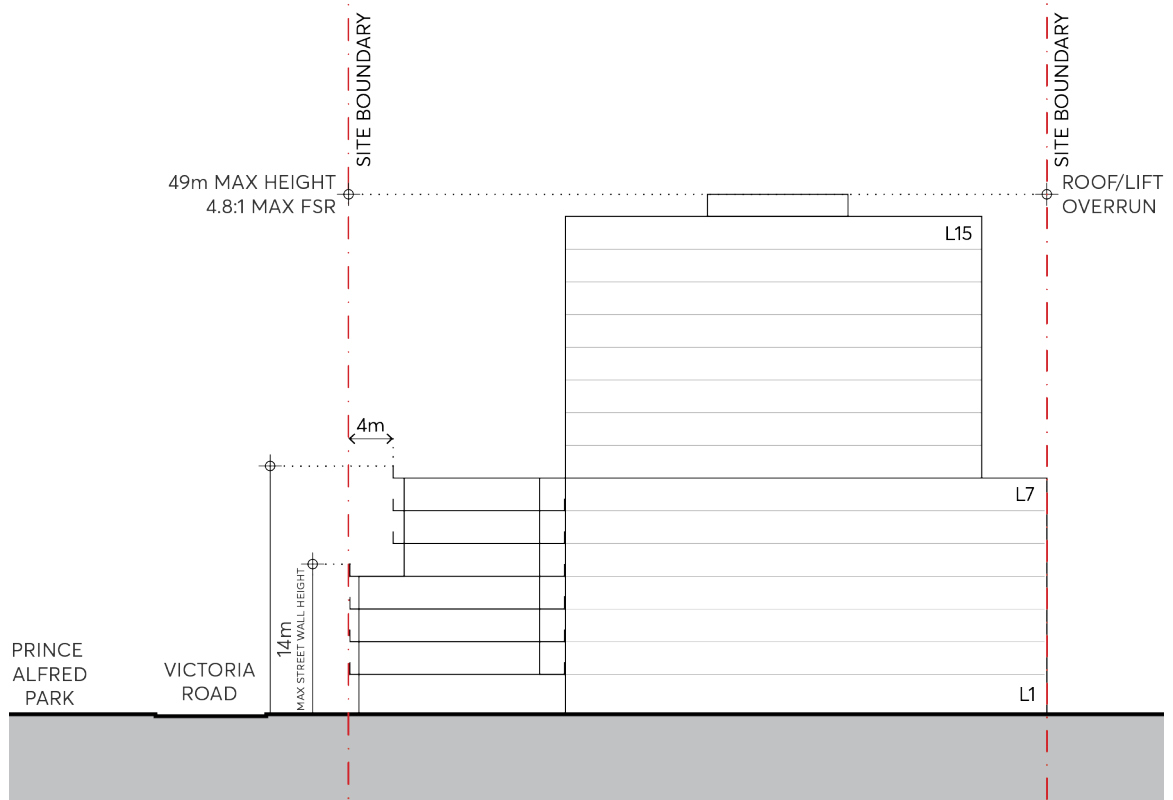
North - South Section of Site Building Envelope
